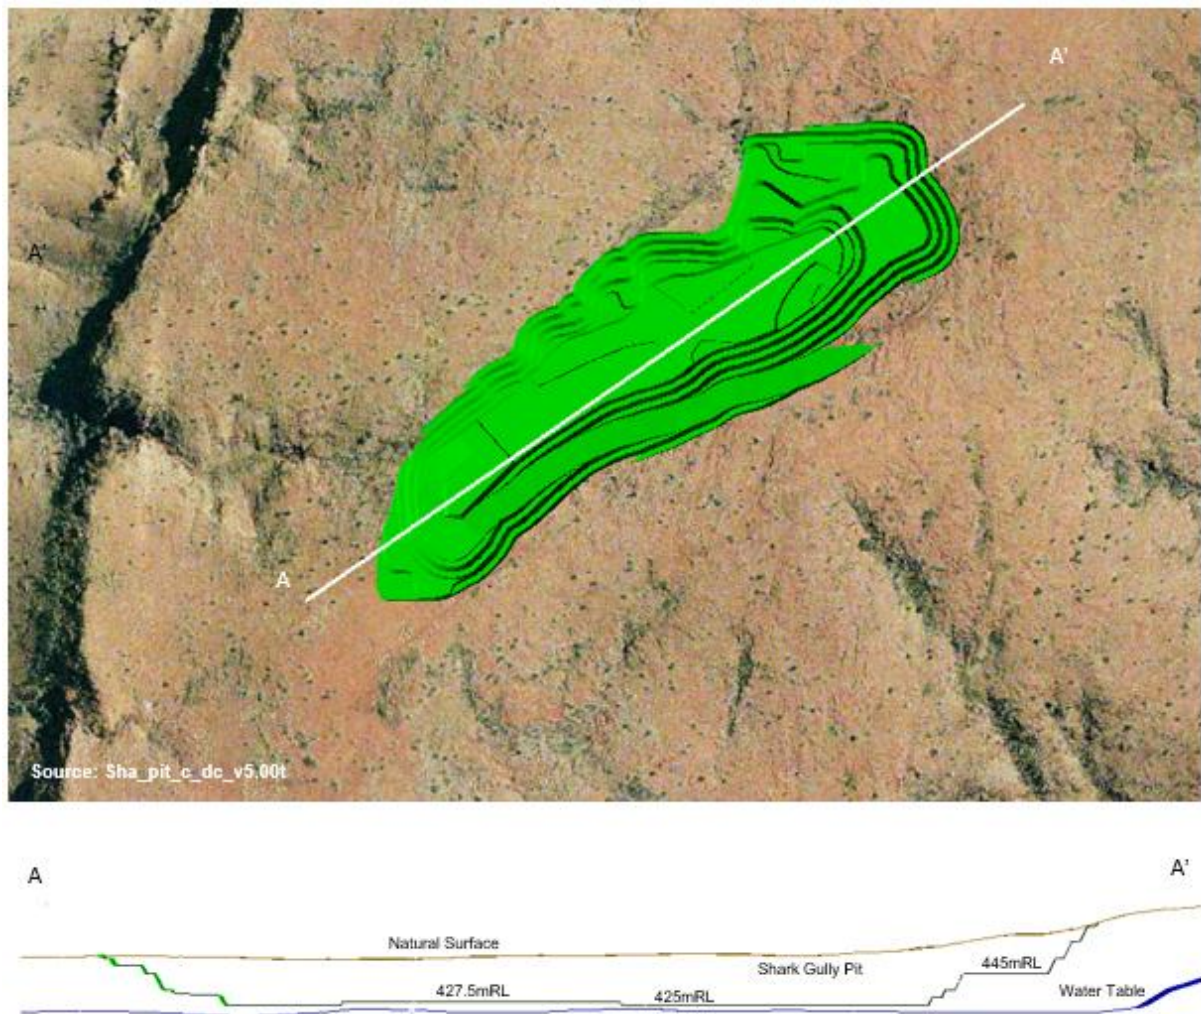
Shark Gully Pit Plan View and Cross-Section (looking north-west)
